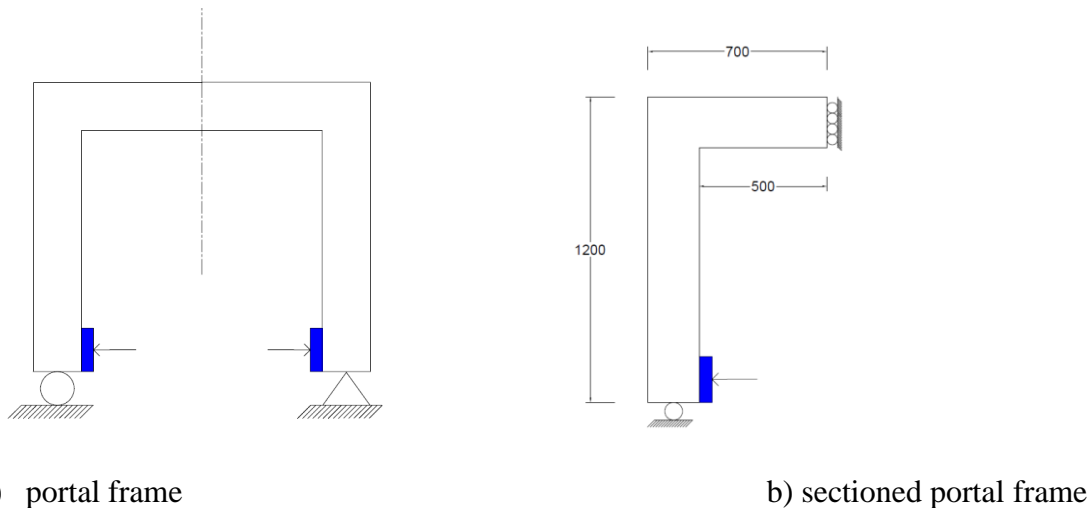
13 geometrical model used for FEM (dimensions are in mm)
